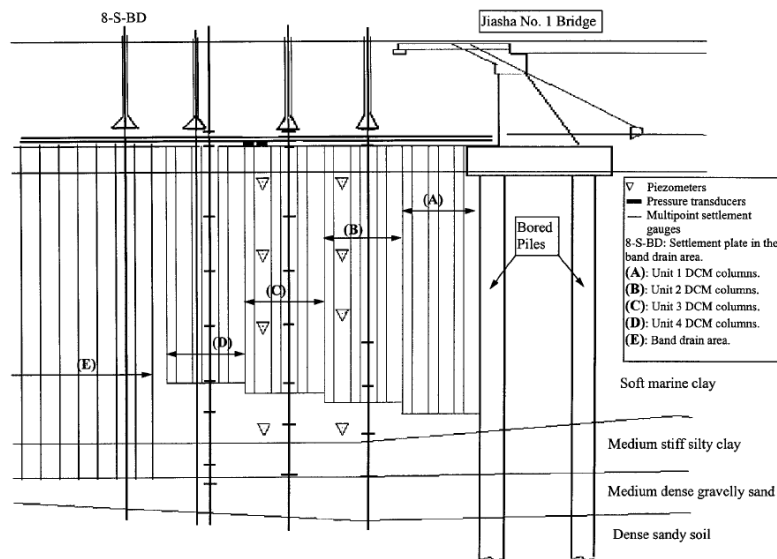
Instrumentation Details of DCM Treated Embankment (Lin and Wong, 1999)
